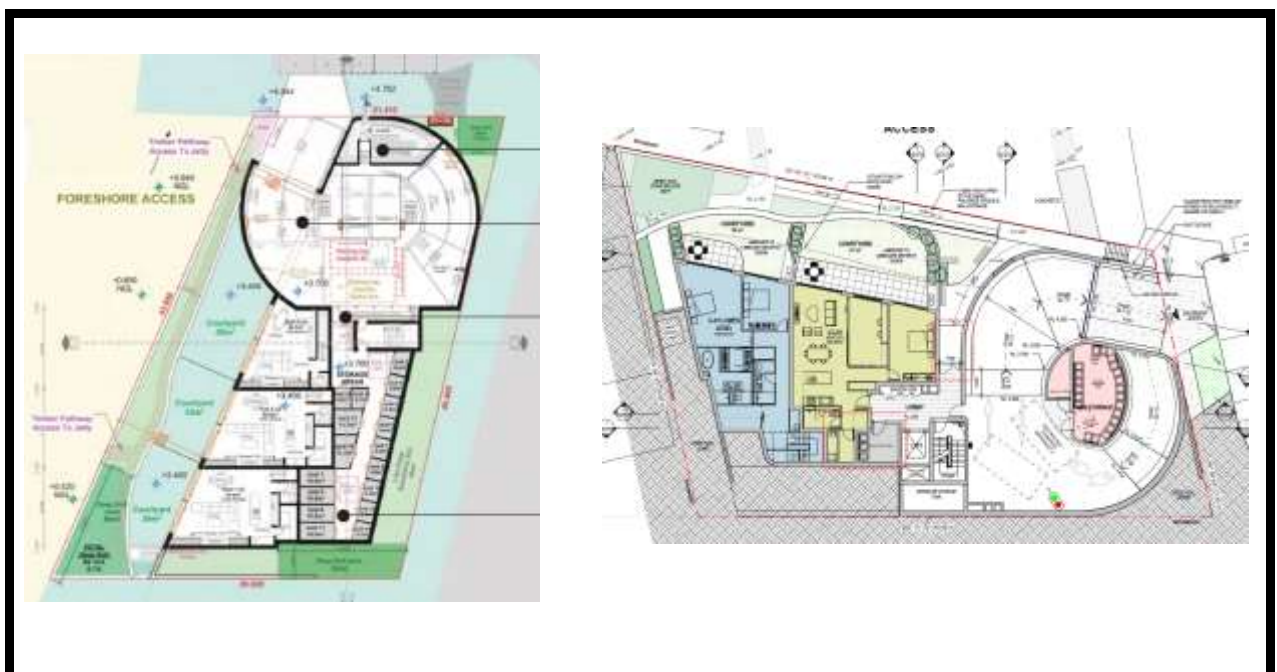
Approved layout of Basement 1 (left) and proposed layout of Basement 1 (right)
